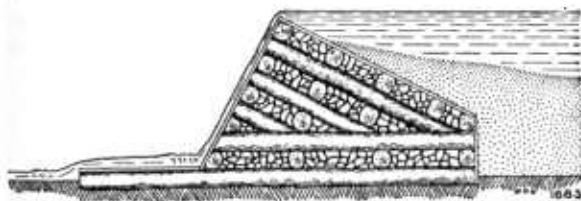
Crib dam. This construction is recommended for dams more than 6 feet high
